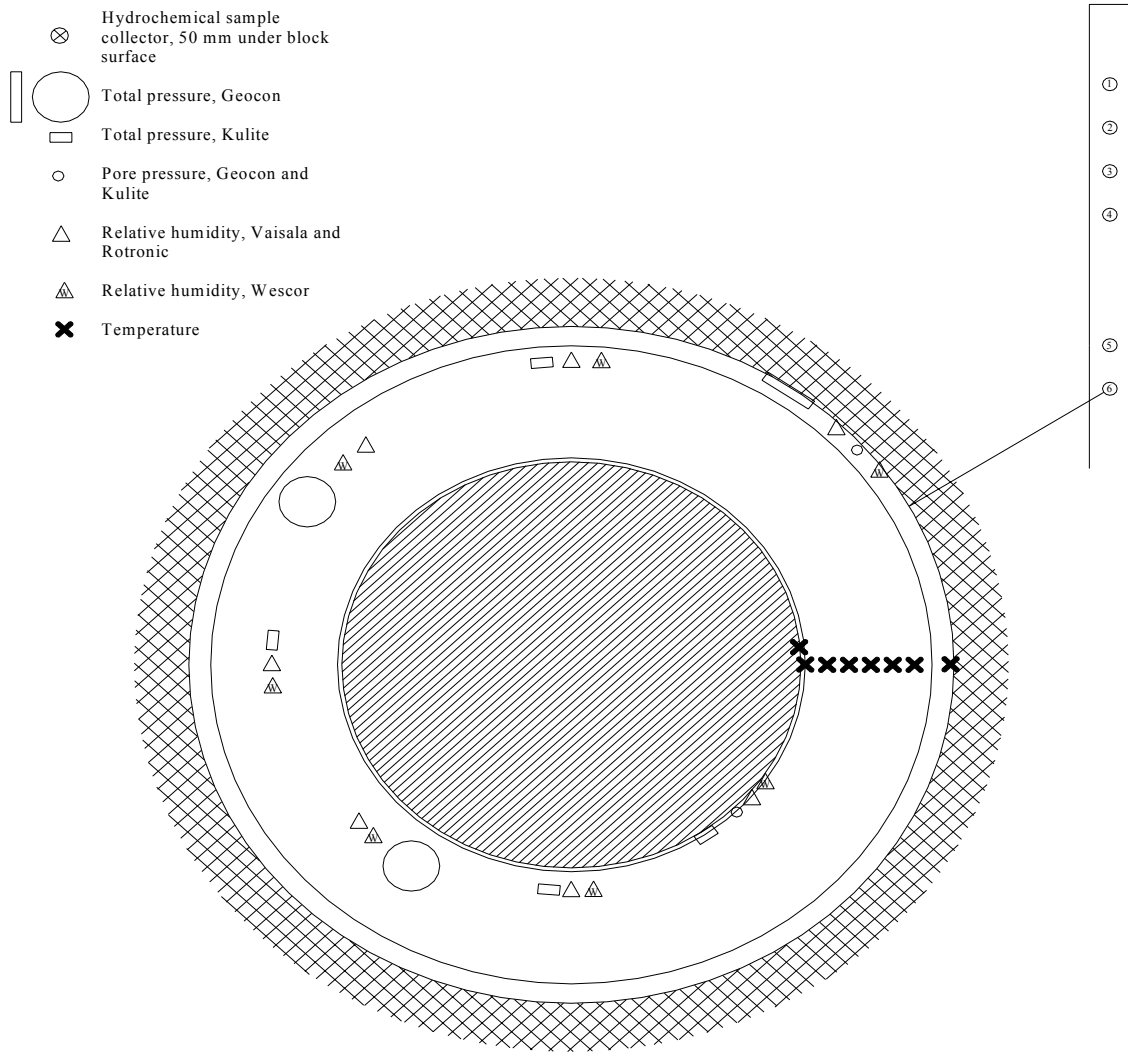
Schematic view over the instruments positions in the bentonite rings in deposition hole 6. The instruments are placed in eight vertical sections, where four sections are represented in each instrumented block.
